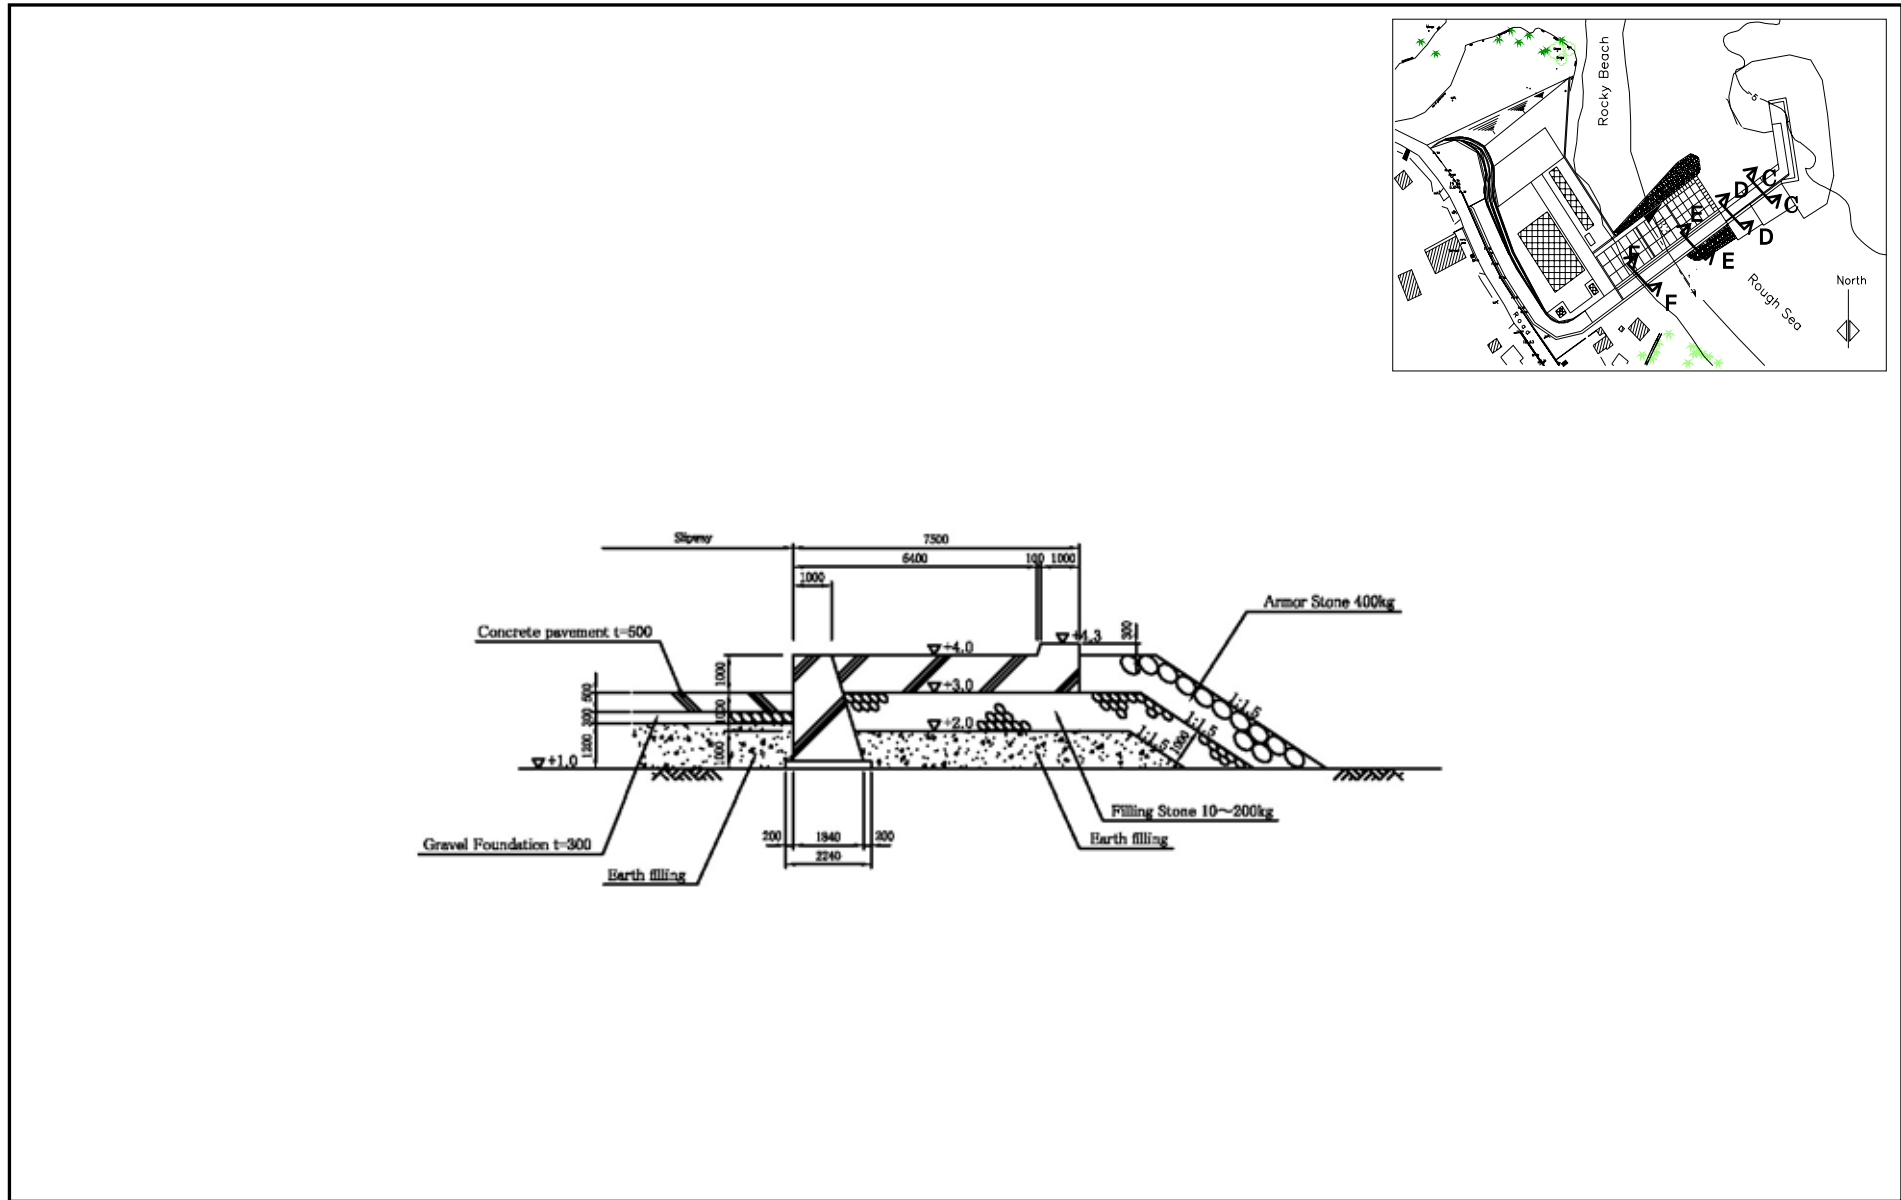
(7) Cross Section for Revetment (Section F-F)
